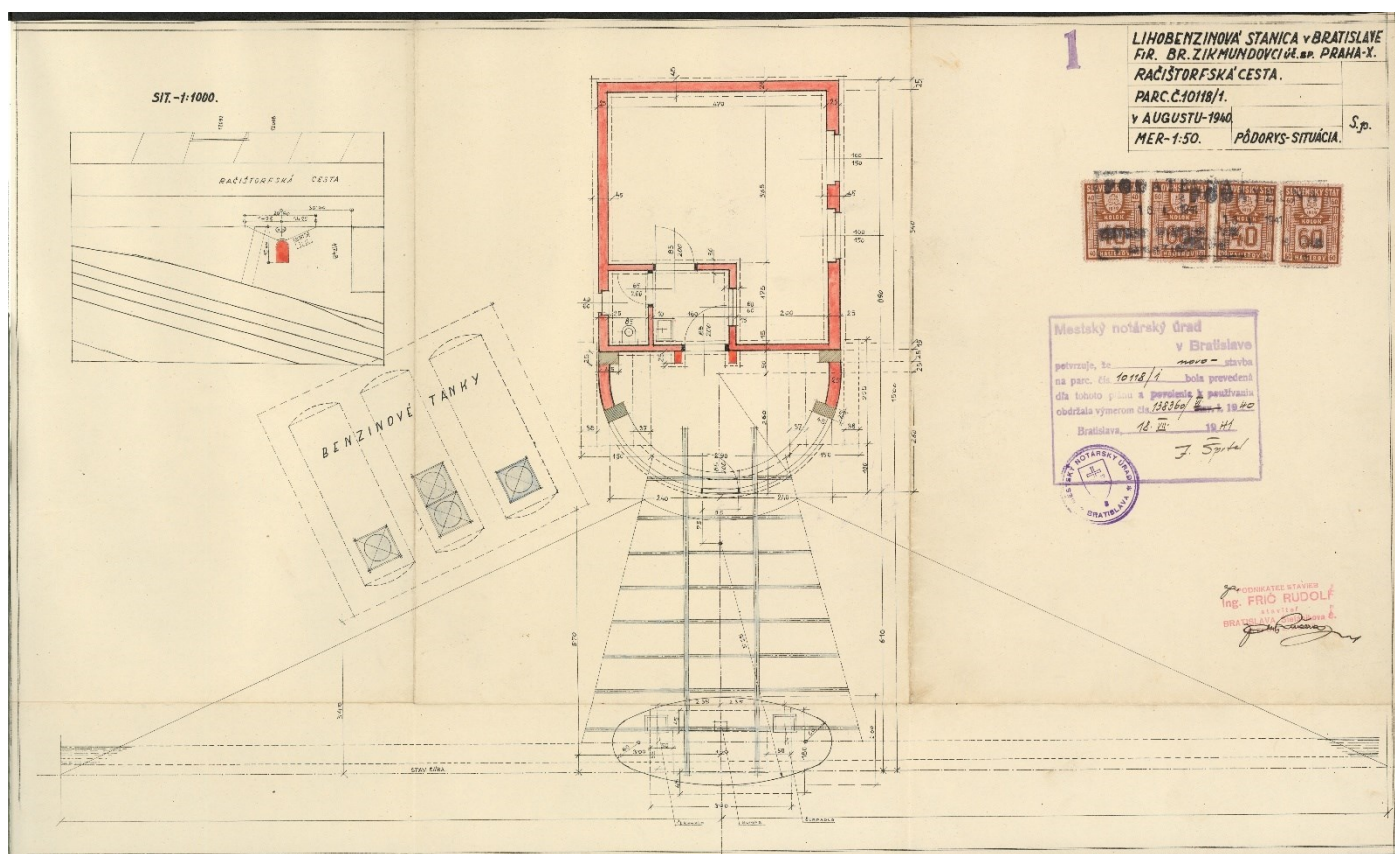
Jan Slaviček, The Zikmund Brothers' gas station, Račianska Street, Bratislava, 1940. Ground floor and site plan. (Source: Bratislava City Archives, 1940)
